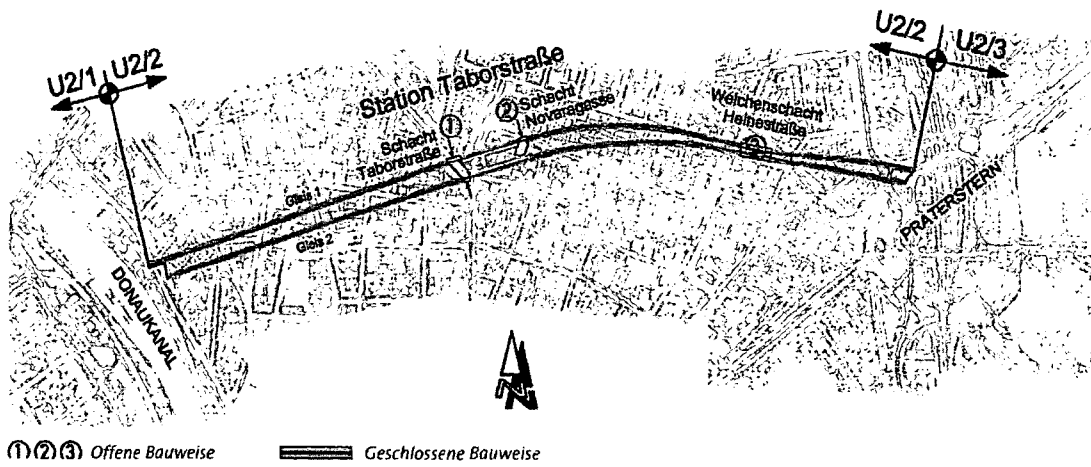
"U2/2 Taborstraße" tunnel layout
